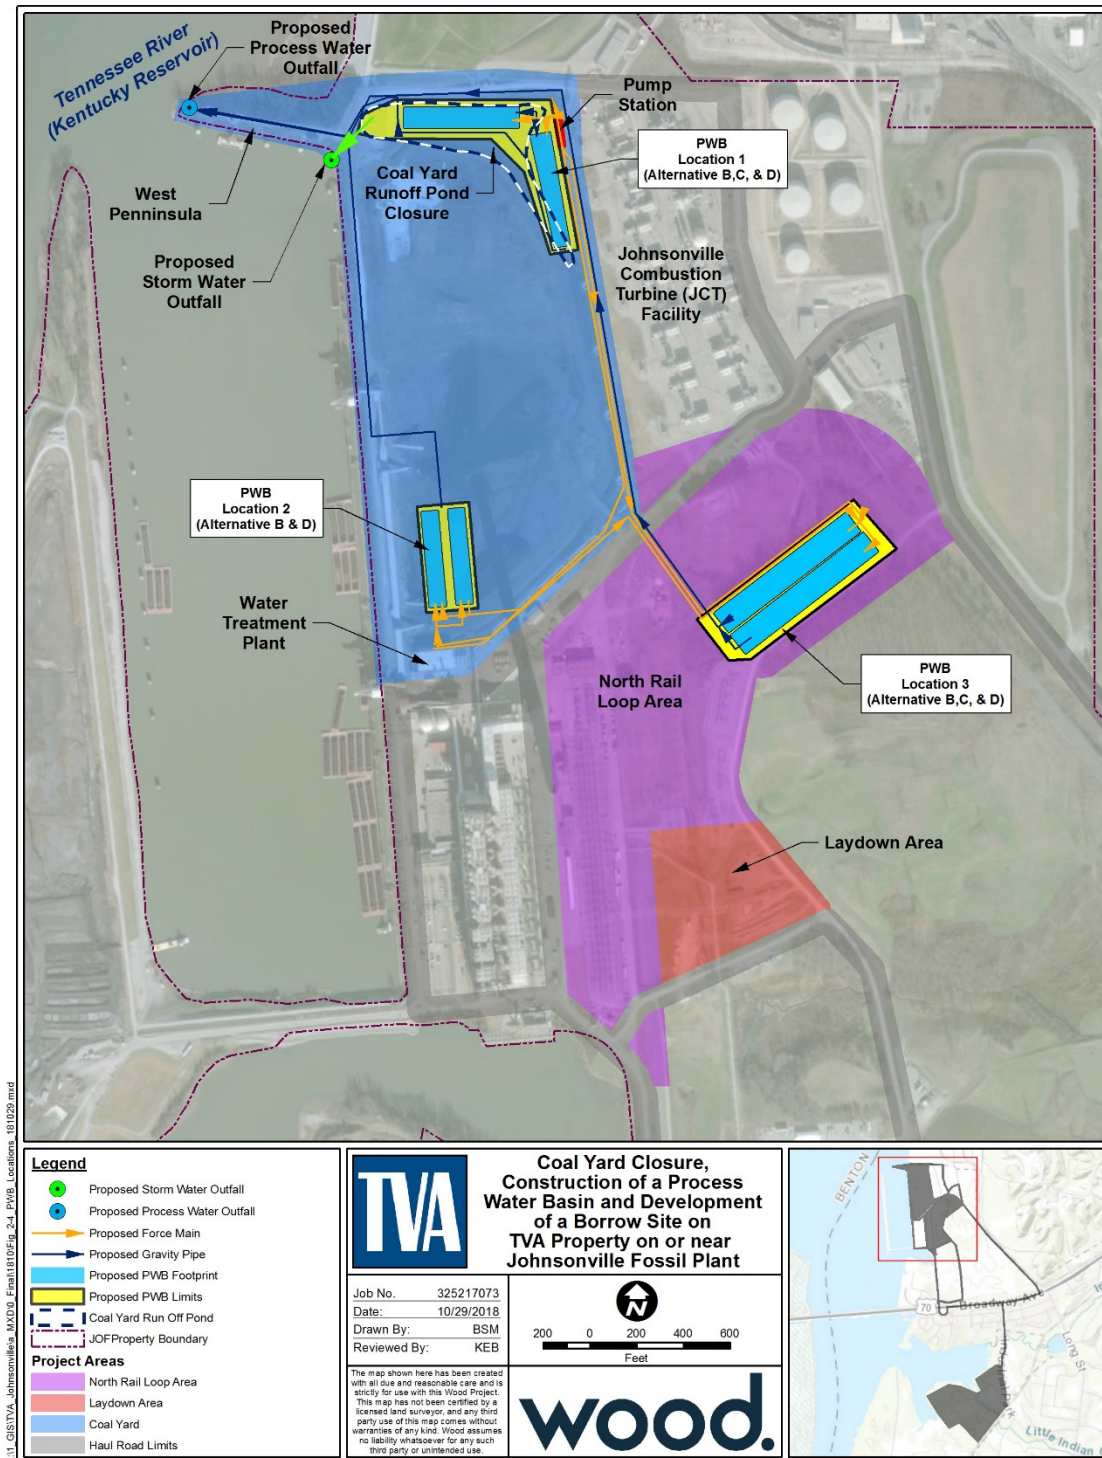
Coal Yard Runoff Plan Closure and Construction of the Process Water Basin
